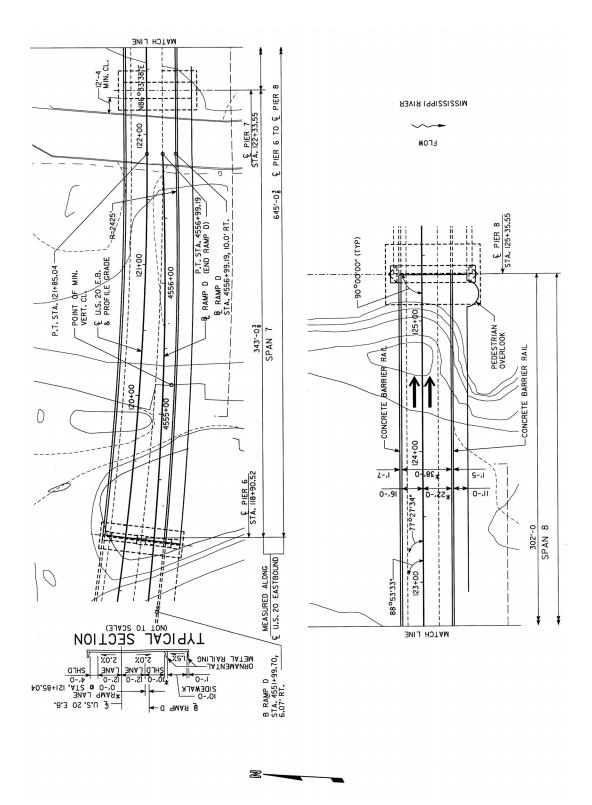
U.S. 20 Eastbound Iowa Flanking Bridge
